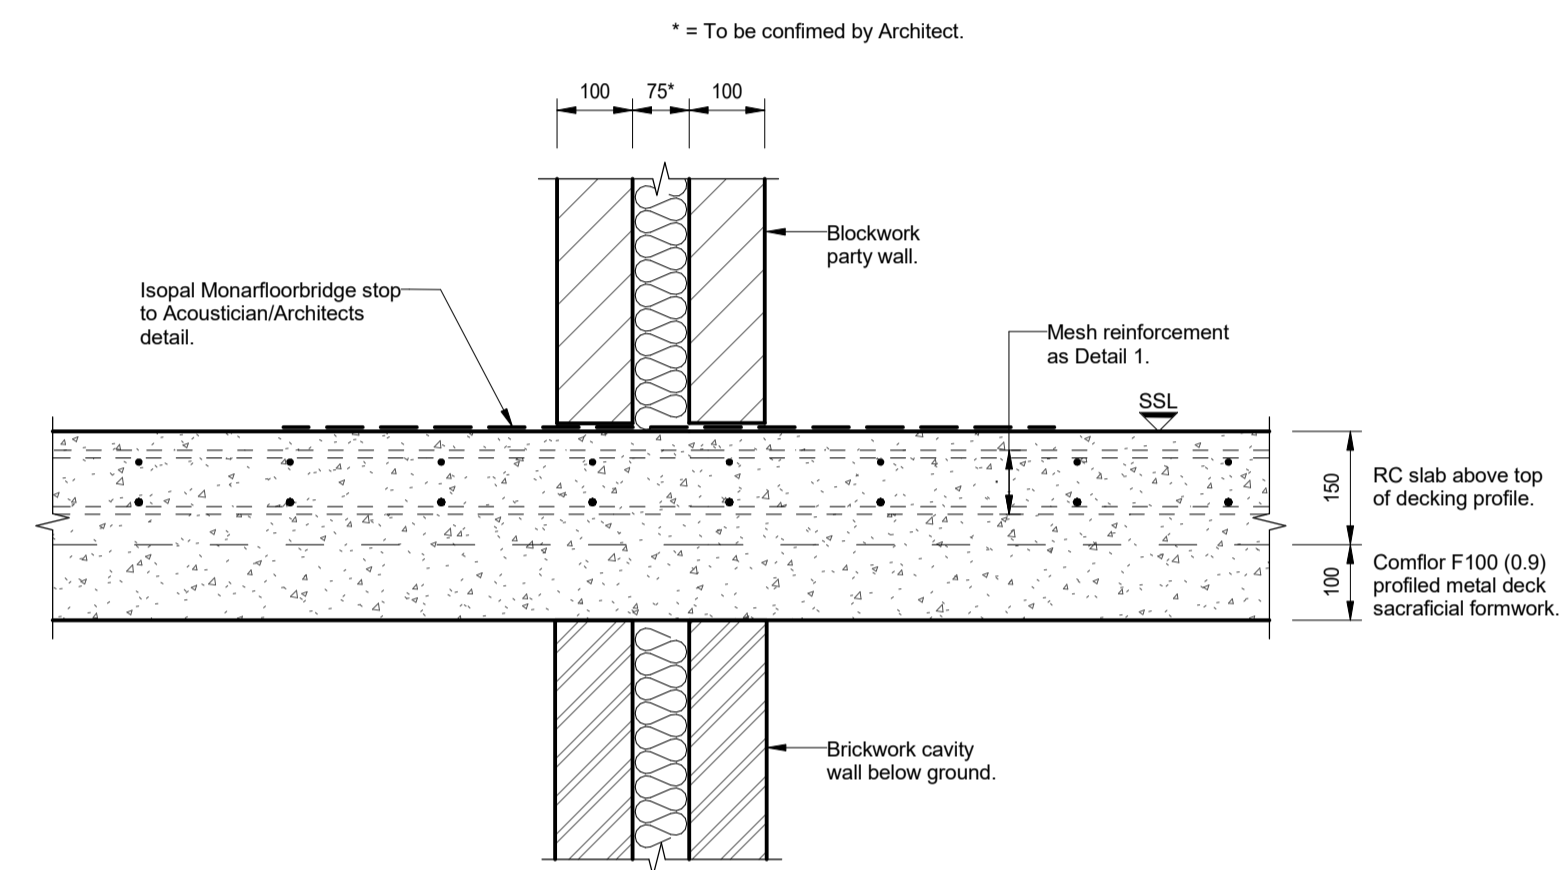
Proposed Bearing onto Sleeper Wall Off Existing Foundation
